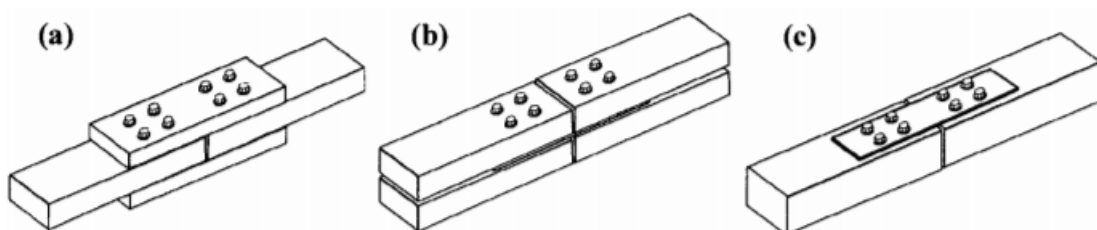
Double-shear timber connections: a) W-W-W connection b) W-S-W connection c) S-W-S connection [6]
